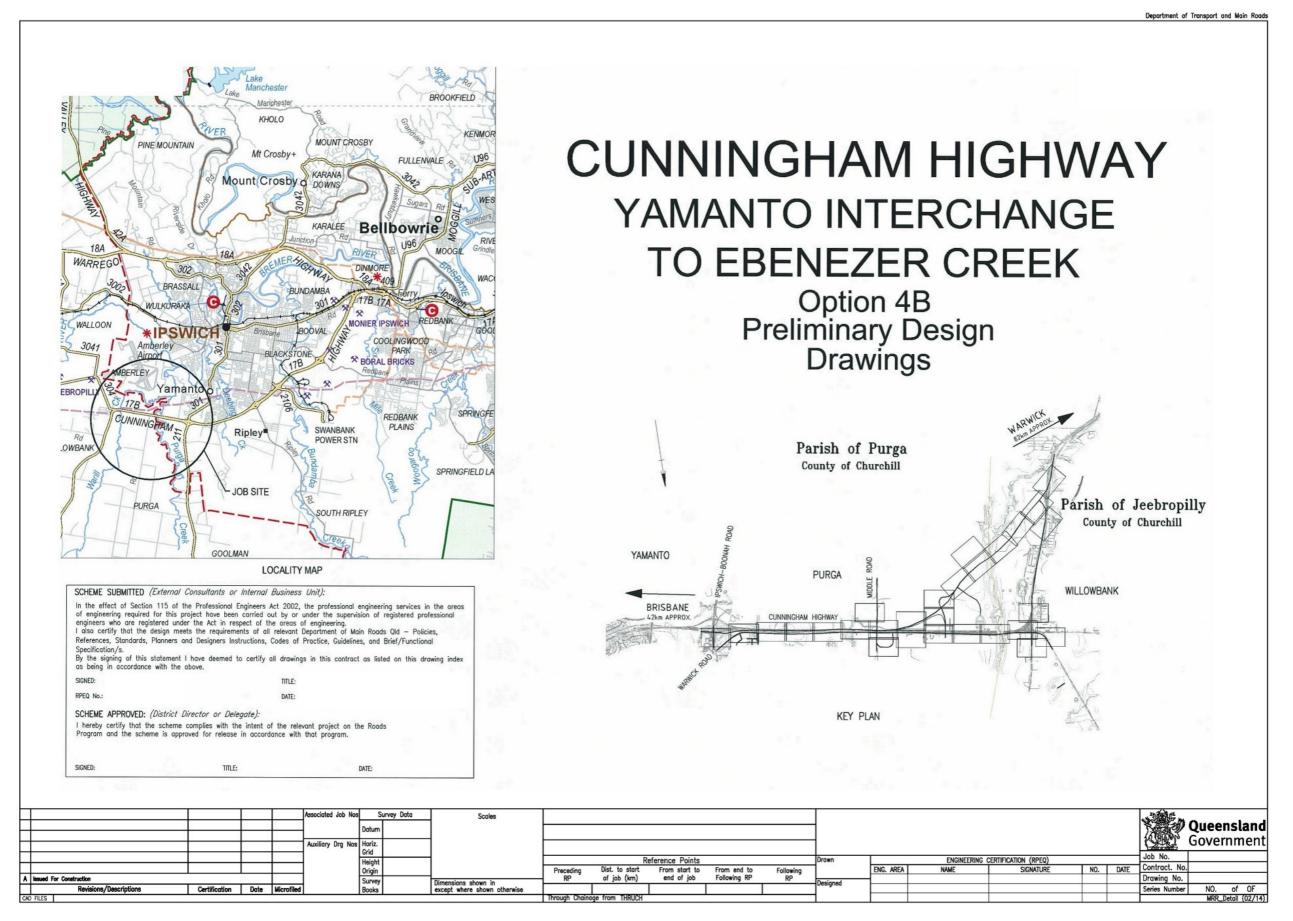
(d) – Locality plan and drawing list – generic example 4
